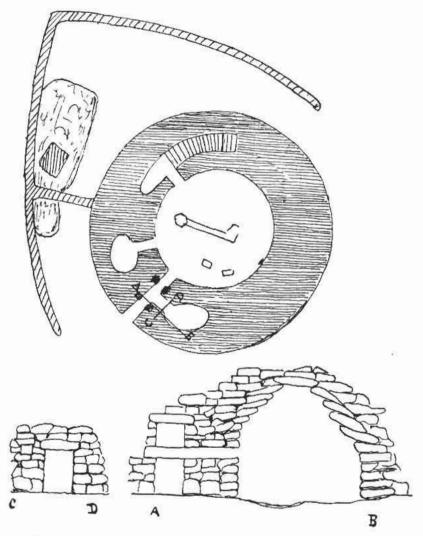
Ground-plan and sections of broch of Ousdale, Caithness.
